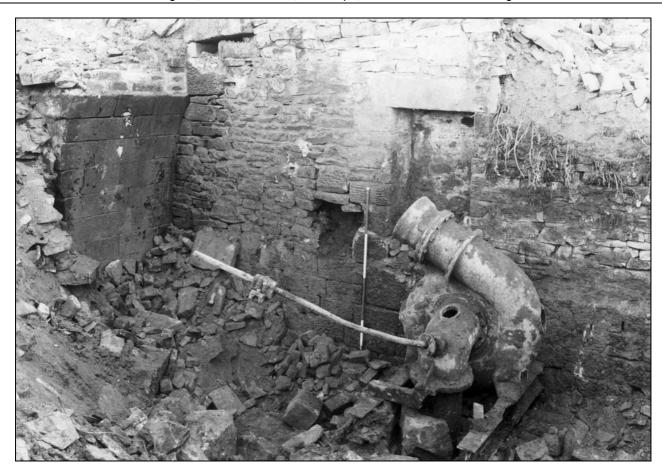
Wheelpit, as exposed during excavation, with turbine in place, looking south-east (film 3, frame 7)
